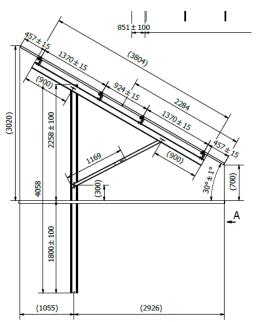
Elevation of the solar Frame showing dimensions including height and depth of piles into the ground.
